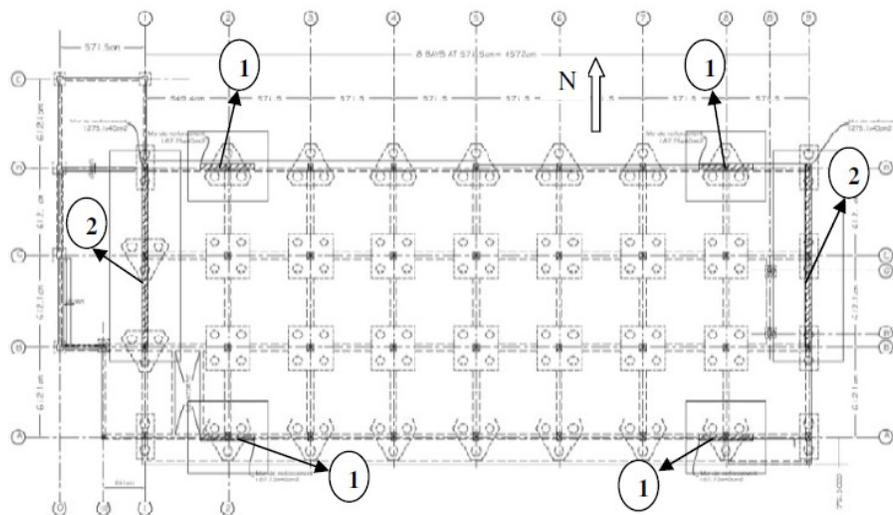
Plan of the foundation after retrofitting; number 1 indicates the walls of 12.75m x 0.4m on the East – West direction and number 2 indicates the walls of 3.52m by 0.4m on the North – South direction.
